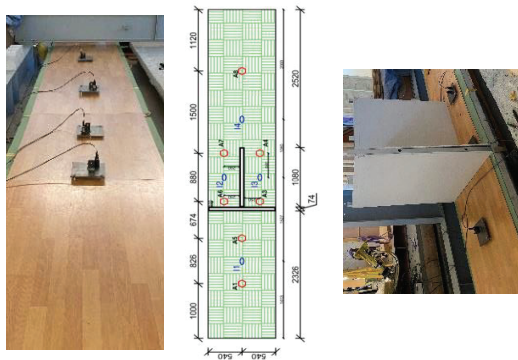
Tested specimen with finishes (left) and partition walls (T-section)
